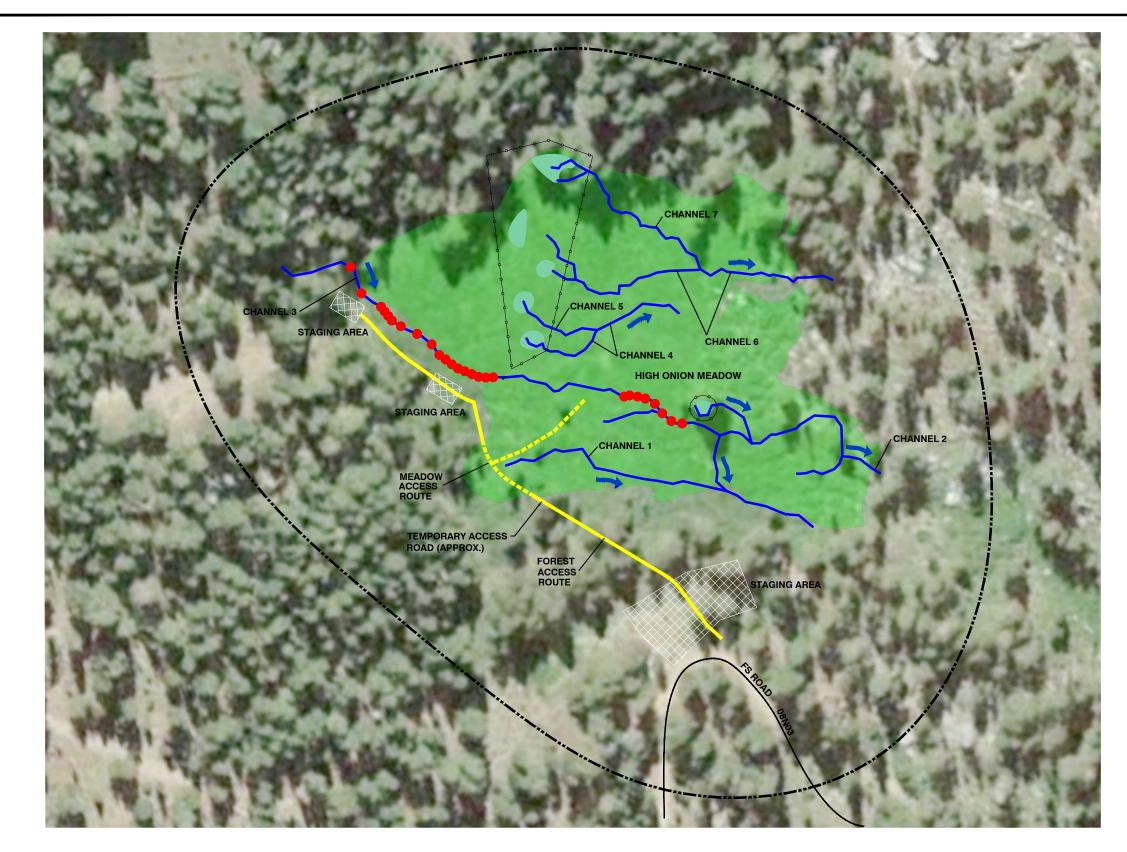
THREE MEADOWS RESTORATION PROJECT HIGH ONION MEADOW PLAN VIEW
